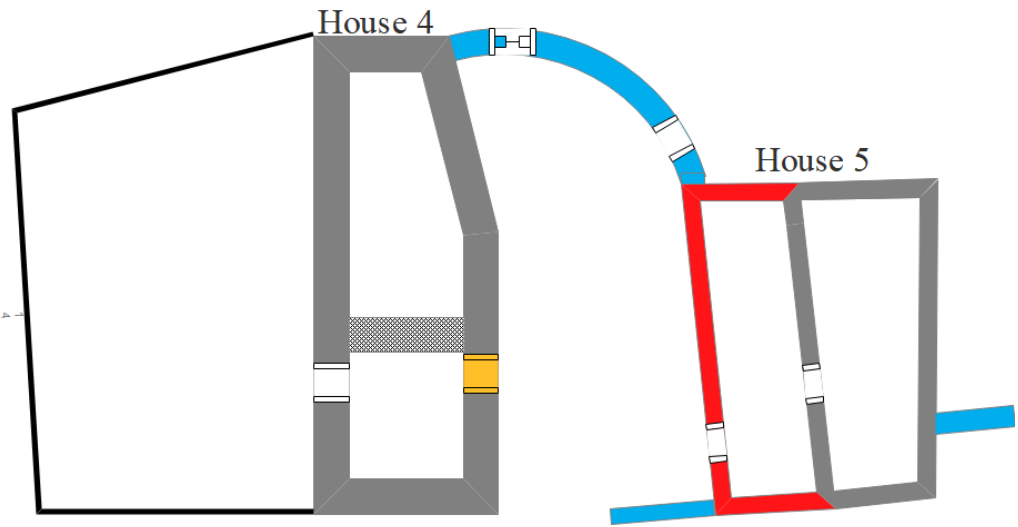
Ground plan of Houses 4 and 5, Sarania. (M. Pawlowski)
